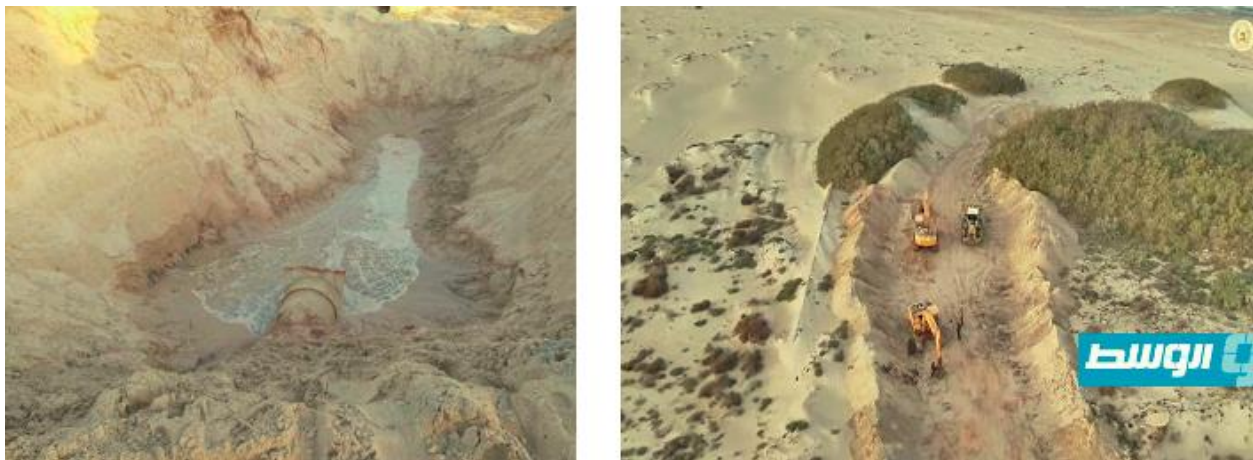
Excavation Work of the Drainage Channel (Alwasat, 2023)
